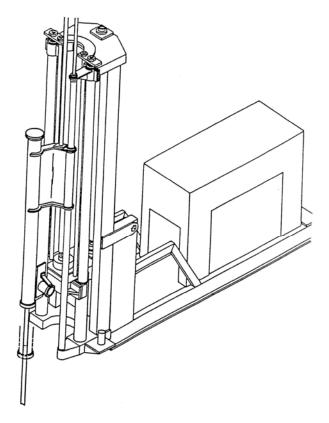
Automatic hammer (McGregor and Duncan 1998).
